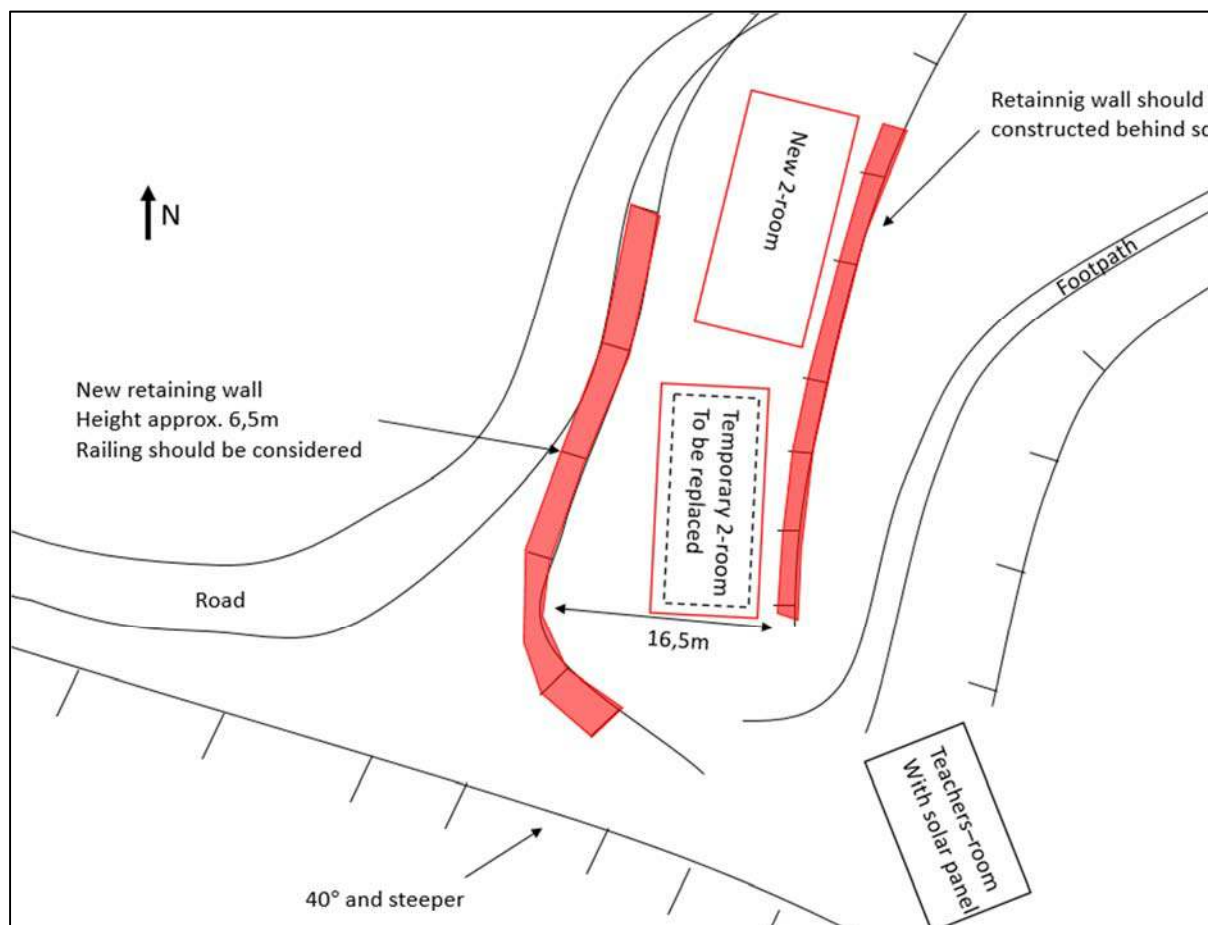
Plan view - Kaileswori. The new buildings should not be placed any further south than the existing temporary building because of the very steep slope. A retaining wall should be constructed between the road and school plot (west). A retaining wall should be constructed on the east side of the new school buildings, to improve local stability and ensure good light conditions.
